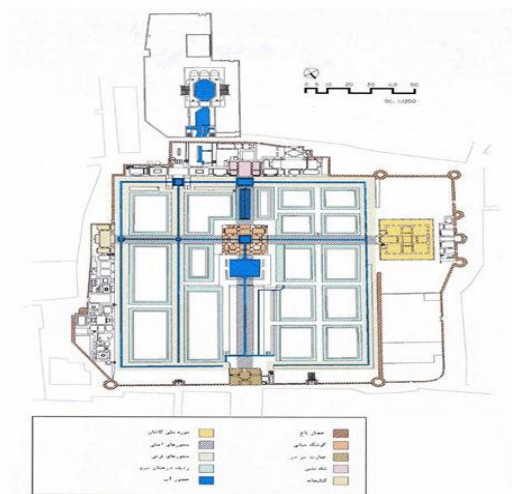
the water streams and ponds inside and Outside of the Fin Pavilion
